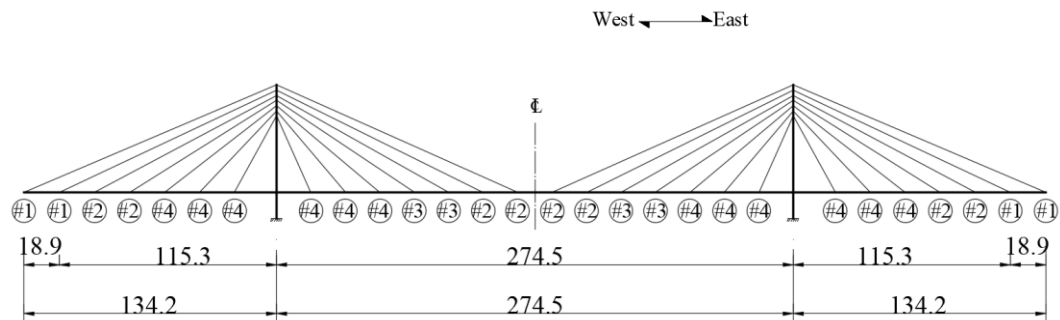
Layout of cable sections adopted from Wilson and Gravelle (1991) (units: m).
